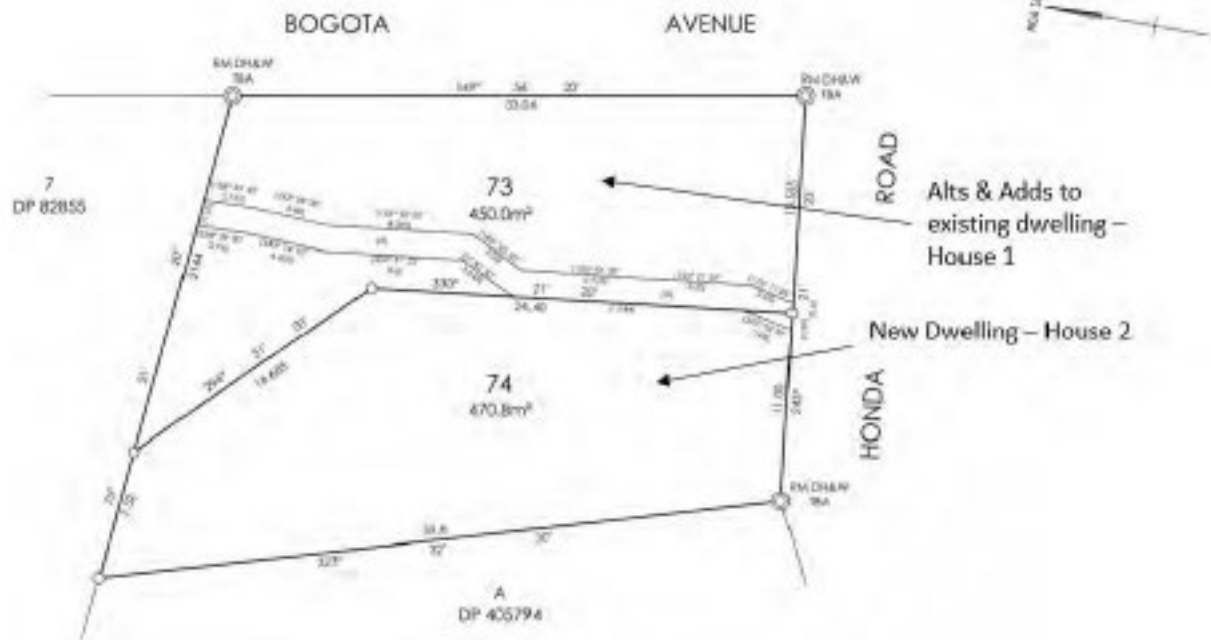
Plan of Proposed Subdivision of Lot B in DP 405794
